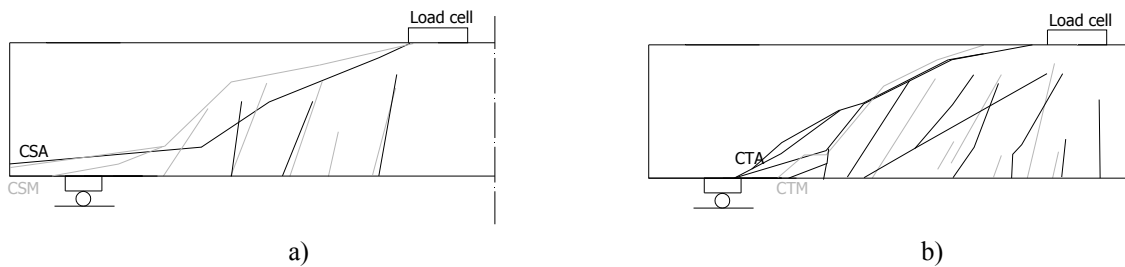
Influence of the quantity of longitudinal steel on the cracking patterns at failure: a) tests without stirrups and b) tests with stirrups
